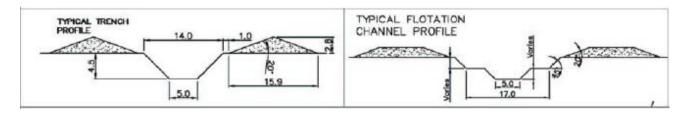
Type of pre-trench "Floatation trench" or "Pipe trench"
